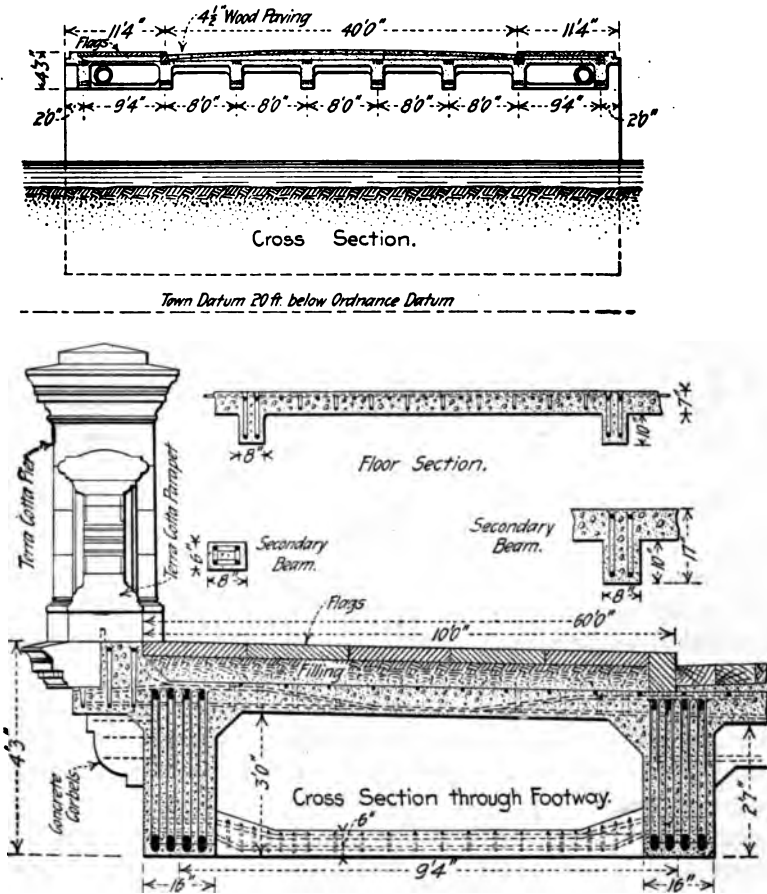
Hennebique Girder Bridge, Sutton Drain, England.
